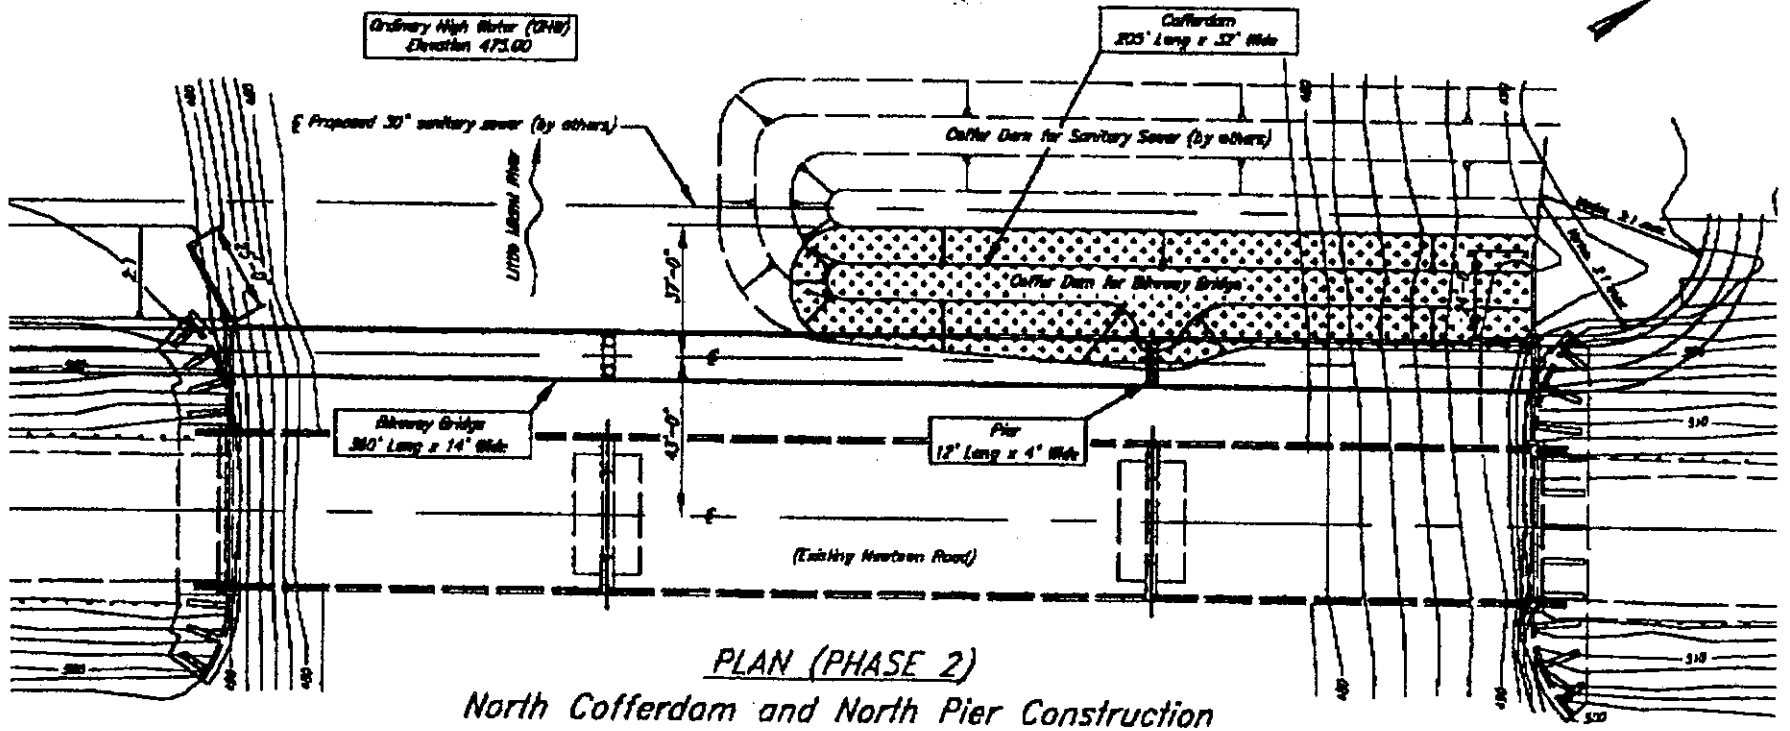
Plan sheet showing the primary impact zone (Phase 2).
